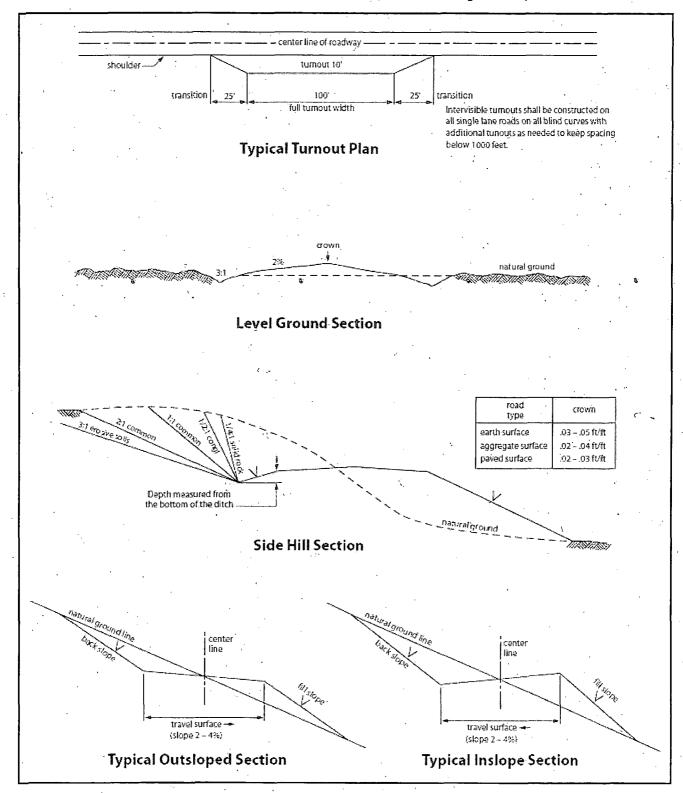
Cross-sections and plans for typical road sections representative of BLM resource or FS local and higher-class roads.
